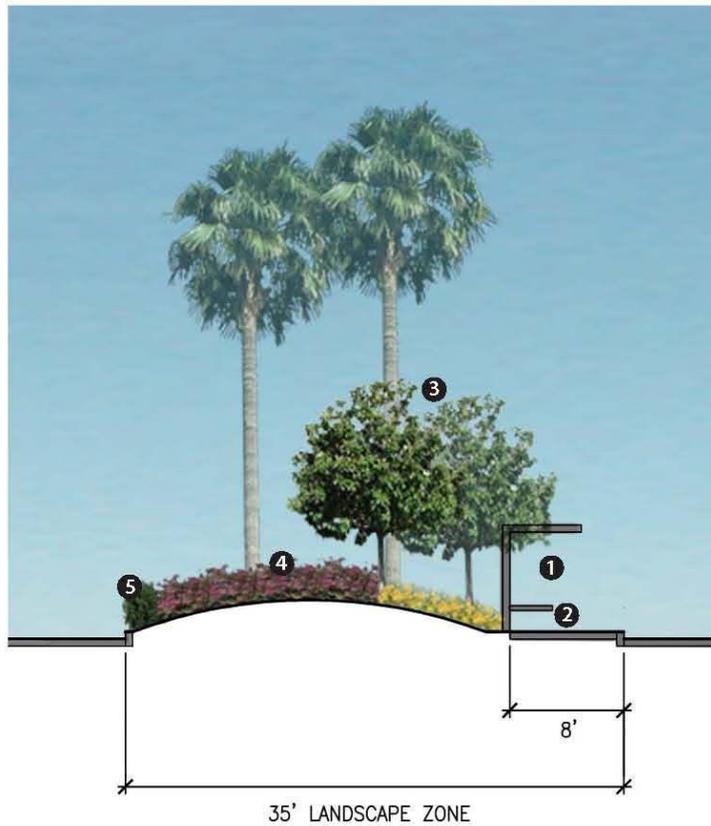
Murrieta Hot Springs Road Setback at Back of House
